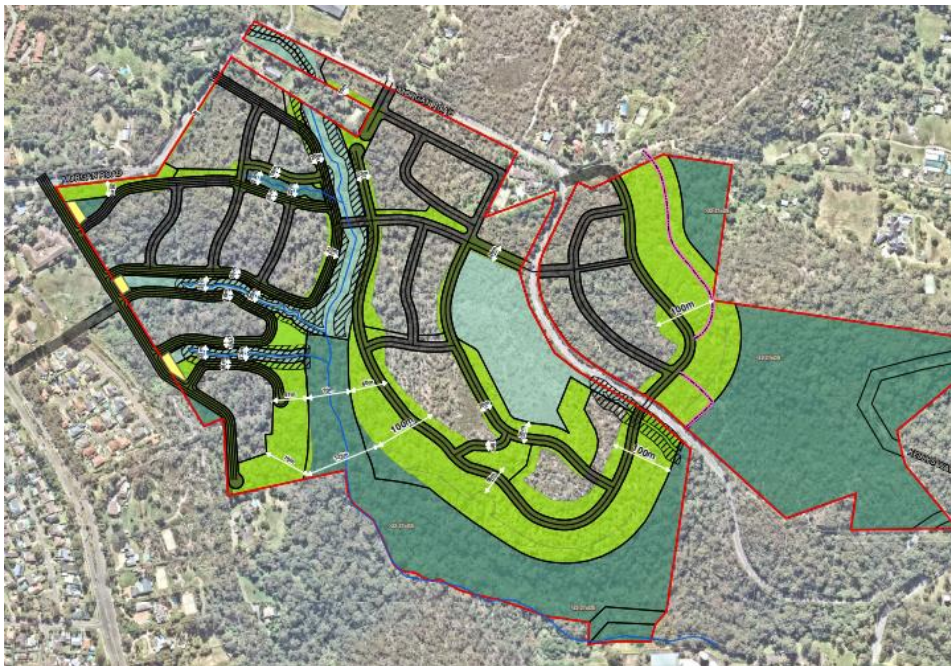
Proposed development design for the PP site showing the extensive asset protection zones
